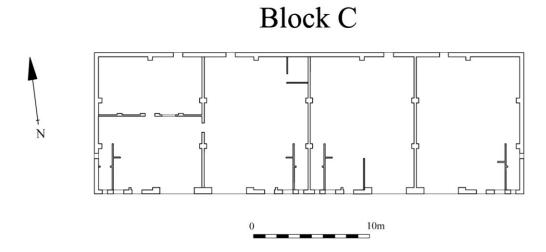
Block C floorplan Modified from Leicestershire County Council plans
